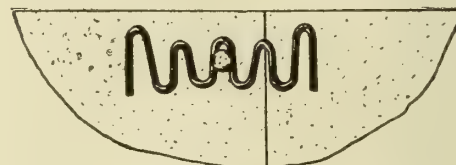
DETAIL OF CONSTRUCTION "DELAC" EXTERIOR STUCCO WORK
